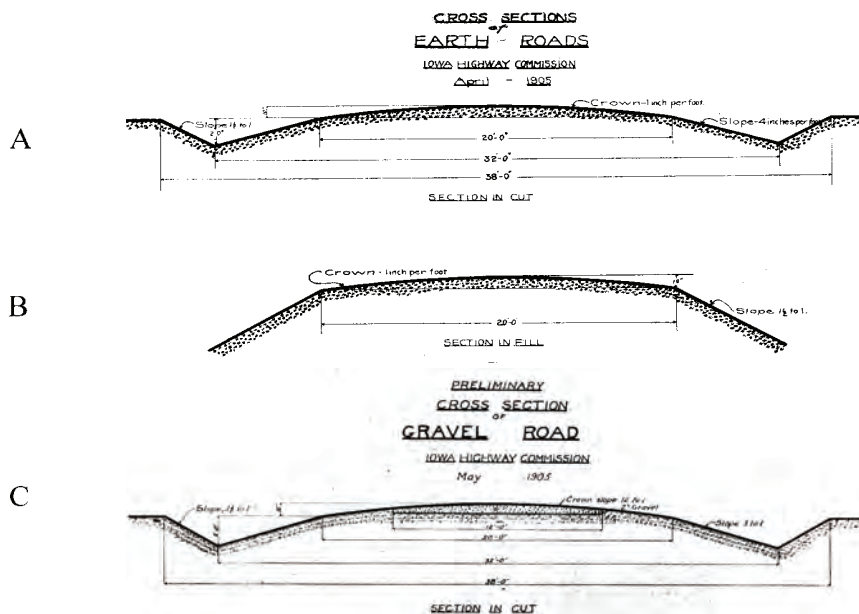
A and B. Cross-sections of Earth Roads (ISHC 1905a:59). C. Preliminary Cross-Section of Gravel Road (ISHC 1905a:74; Harger and Bonney 1919:60).
